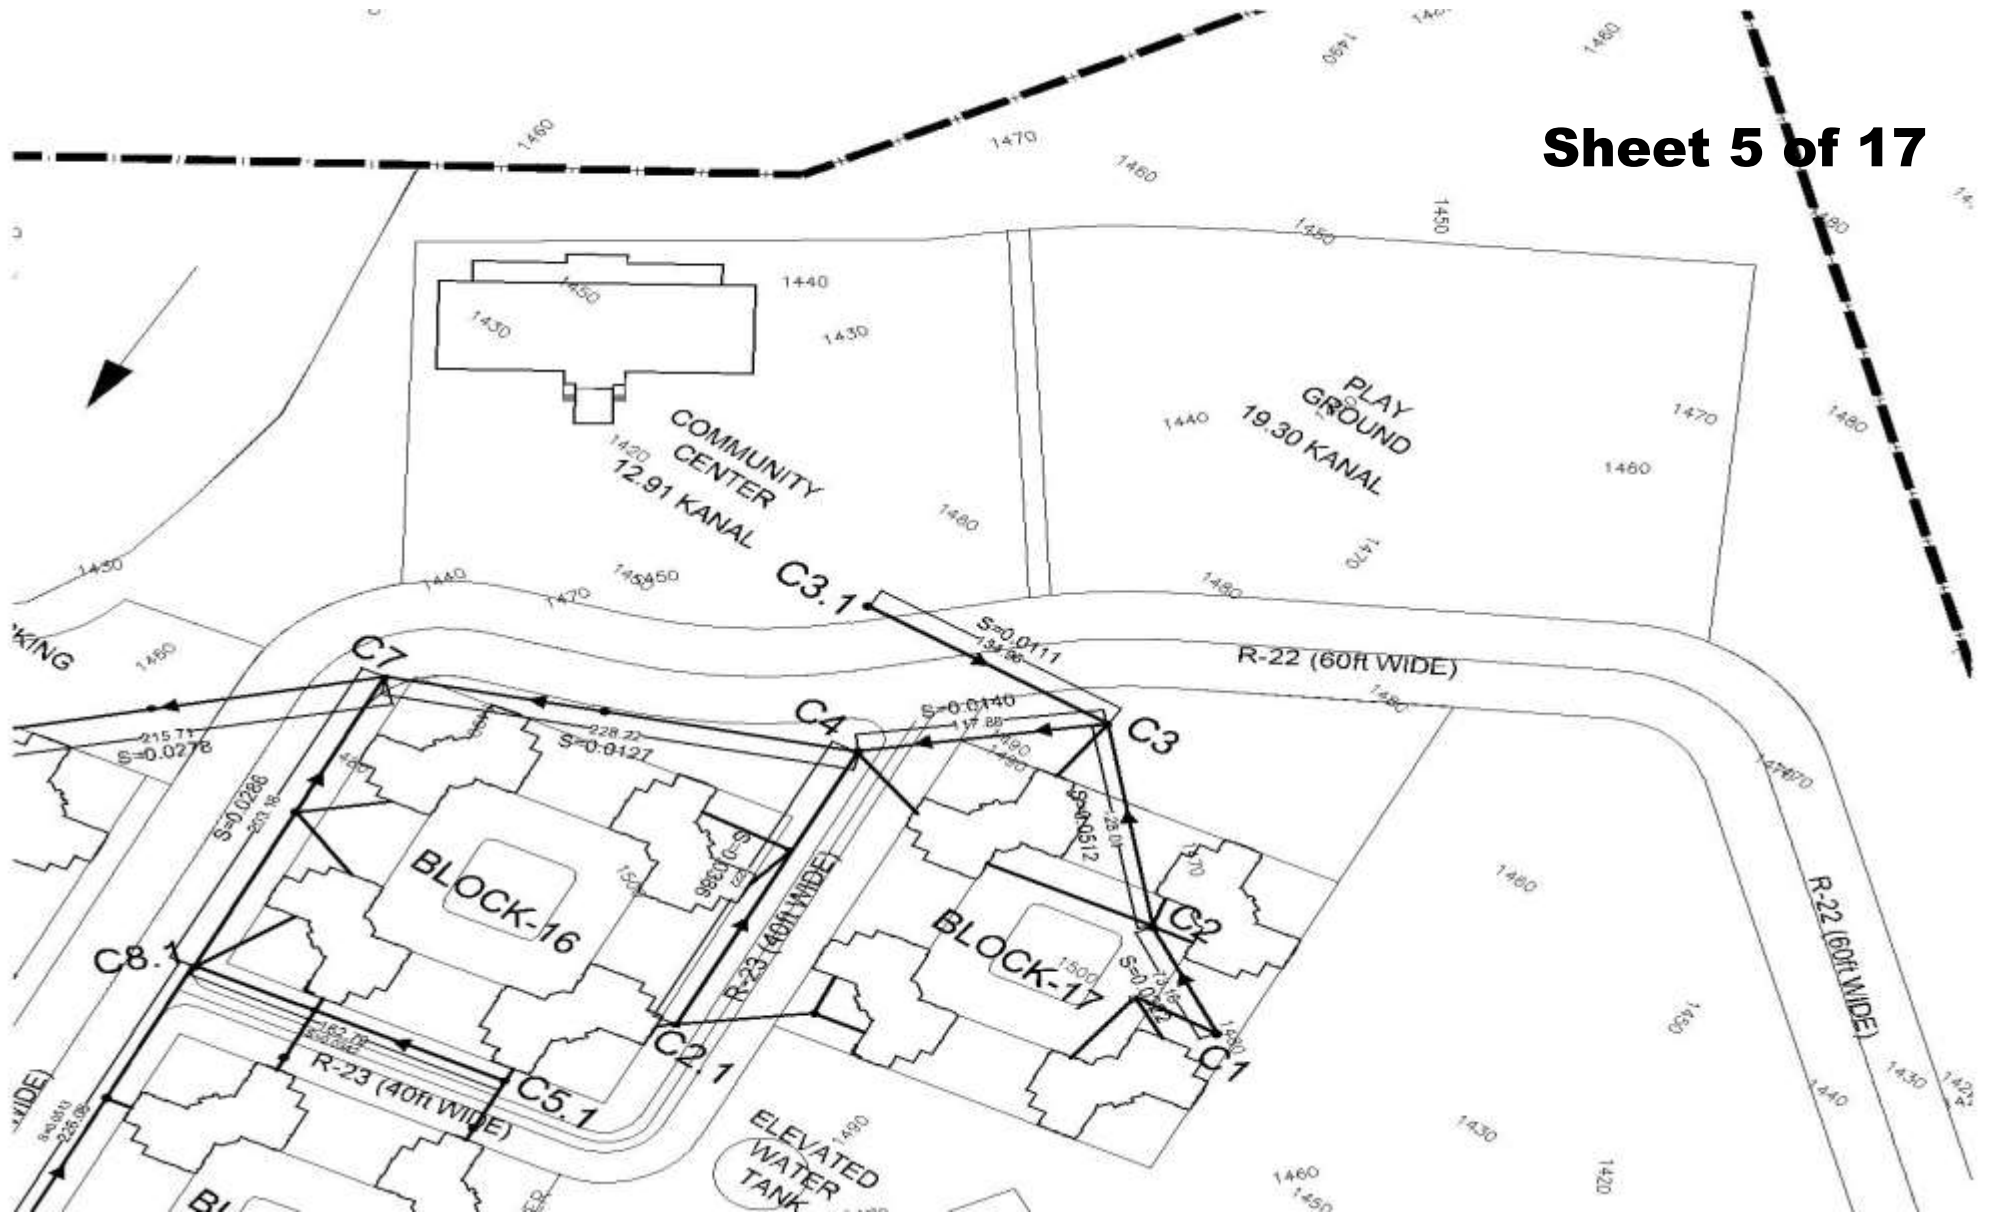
Sewer layout plan of Zone-3 at L/S of MR-01 showing nodes and flow direction
